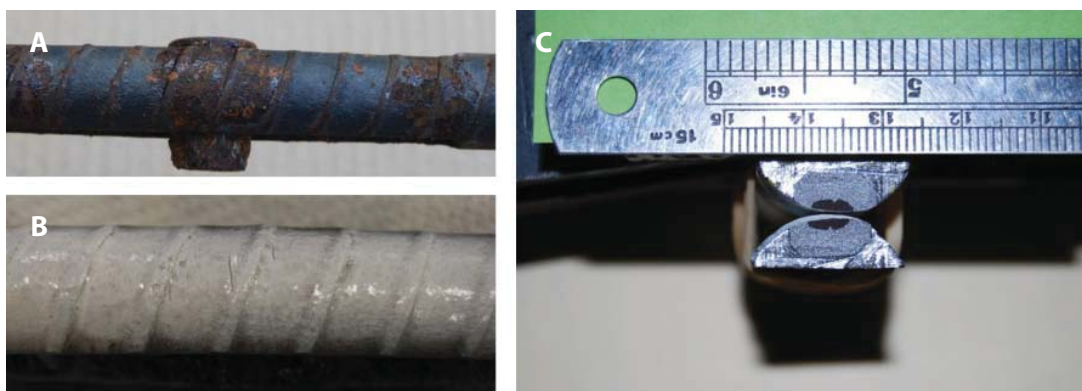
In-hole coupon removal after ~200 days. (A) Stressed section of coupon after cleaning; (B) magnetic particle inspection revealing a crack; (C) crack opened confirming stress corrosion cracking.
